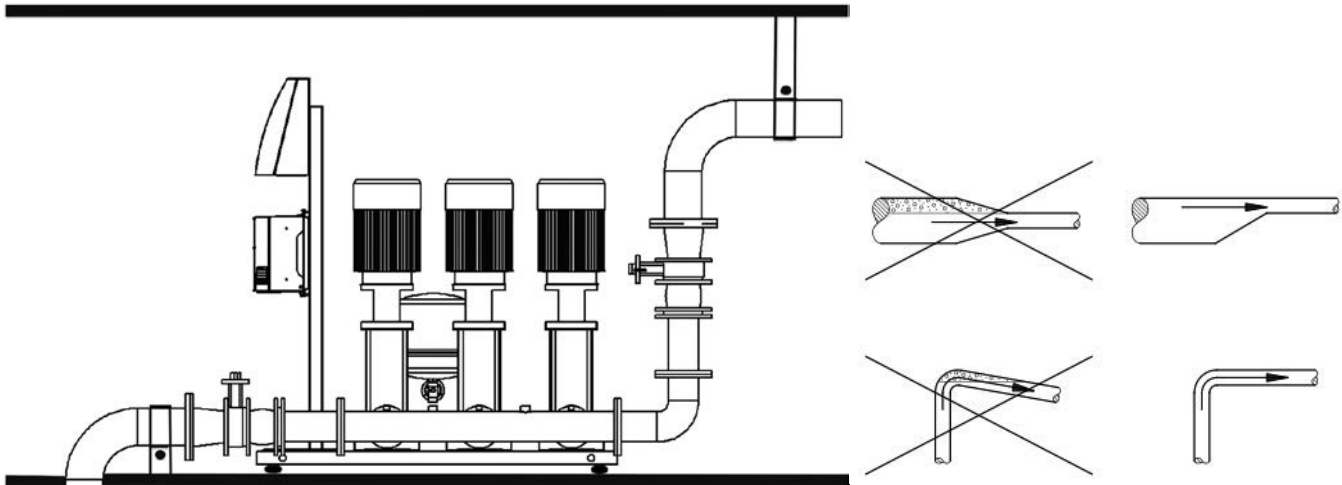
TYPICAL INSTALLATION & PIPEWORK / SUPPORT REQUIREMENTS
